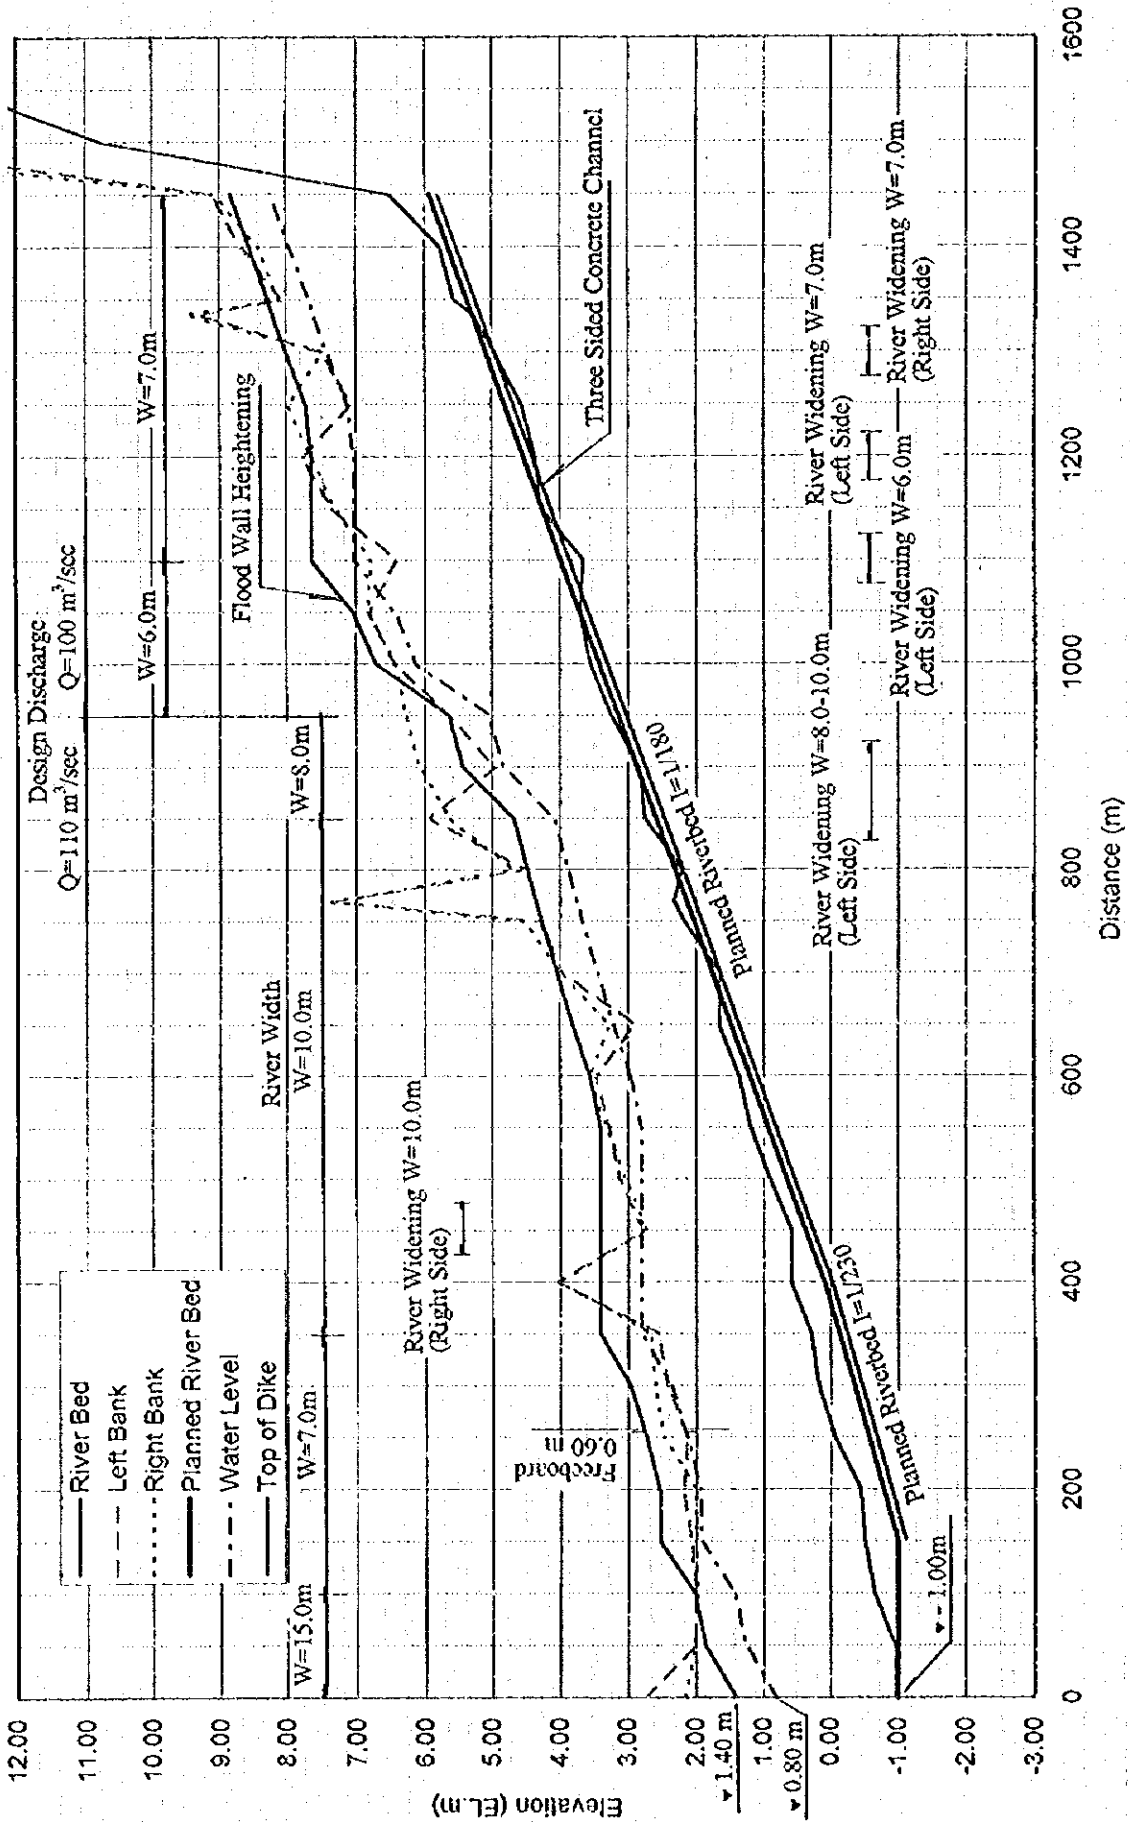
Longitudinal Section of Batu Gantung River Improvement Plan
